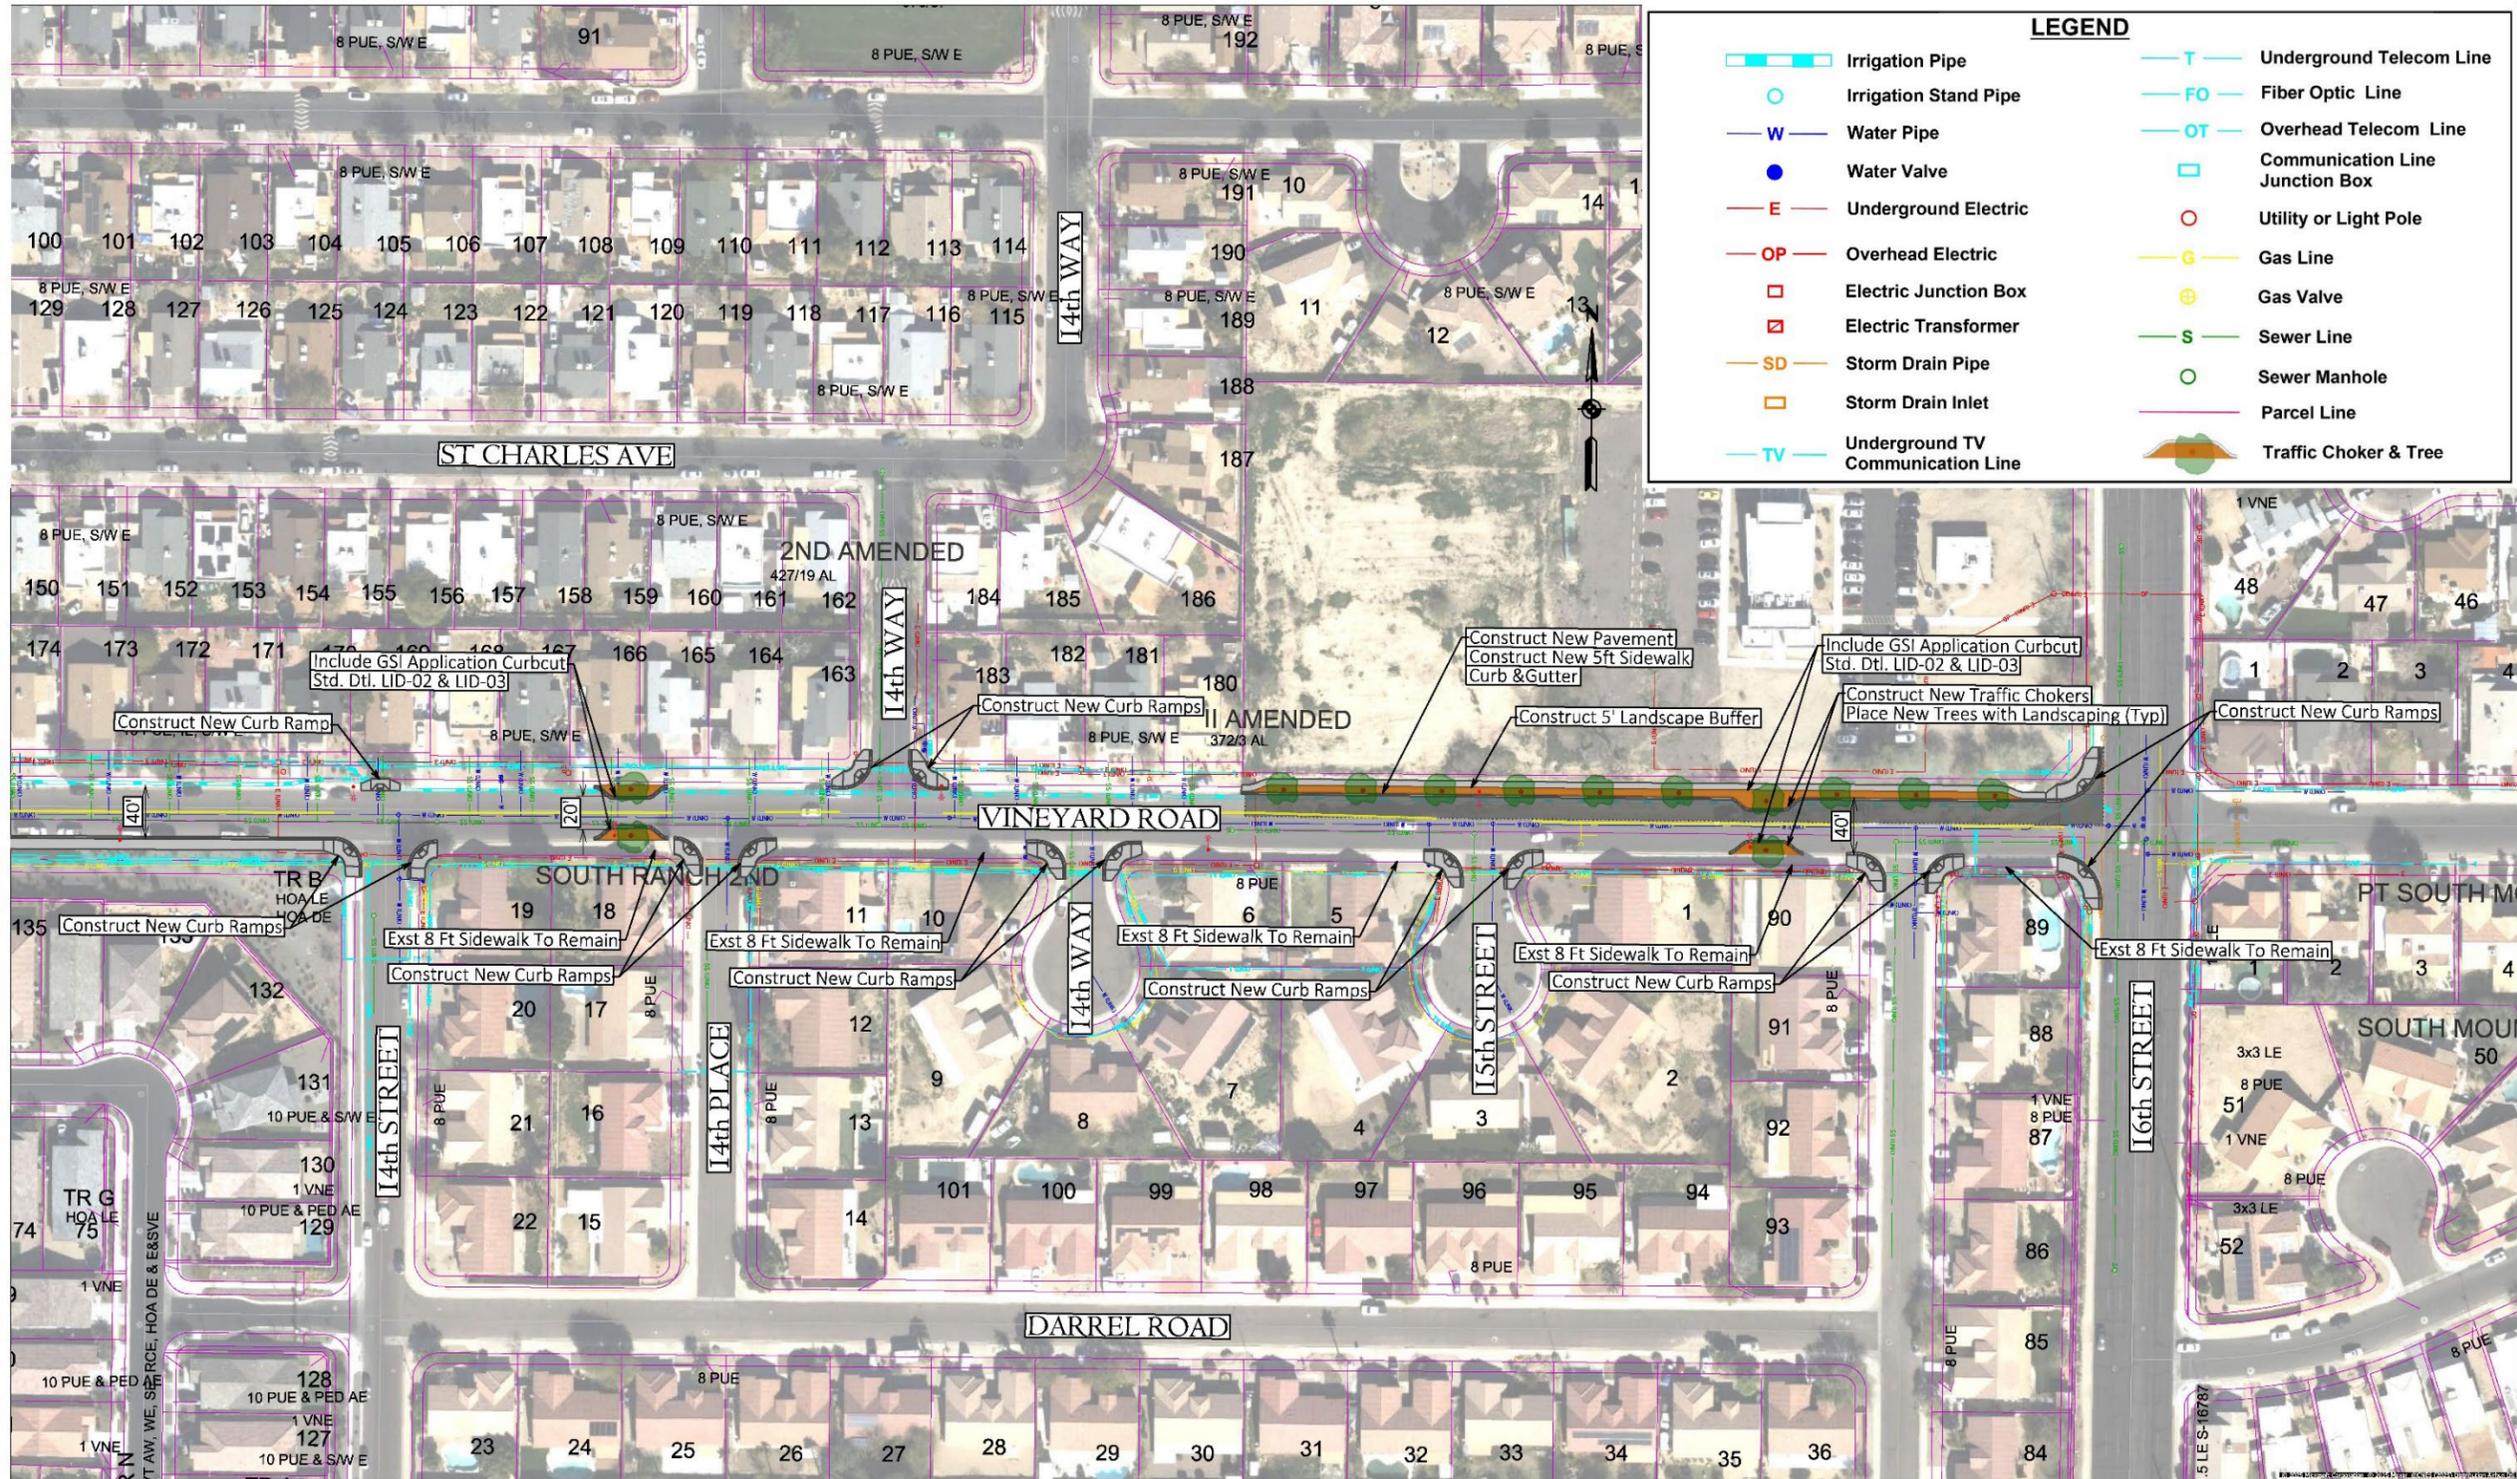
Alternative 2: Modified Cross Section F with Enhanced Sidewalk and Traffic Calming – 13th Street to 16th Street
